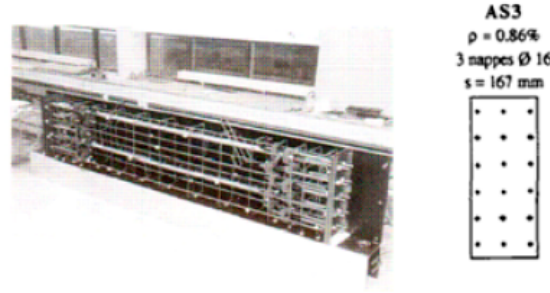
Reinforcement in the Mivelaz anchor and transversal section with longitudinal reinforcement (Mivelaz [1996]).
